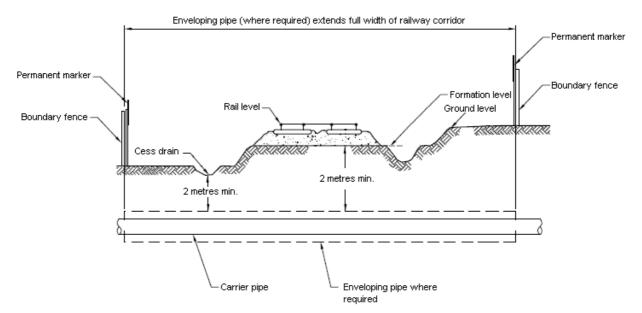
Cross-section Showing Service Pipe Under the Railway Corridor Installation by pipe jacking / tunnel boring / micro-tunnelling / pipe ramming
